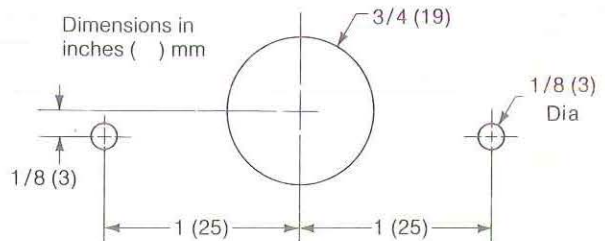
Bulb Mounting Hole Arrangement for Drilling Ductwork
